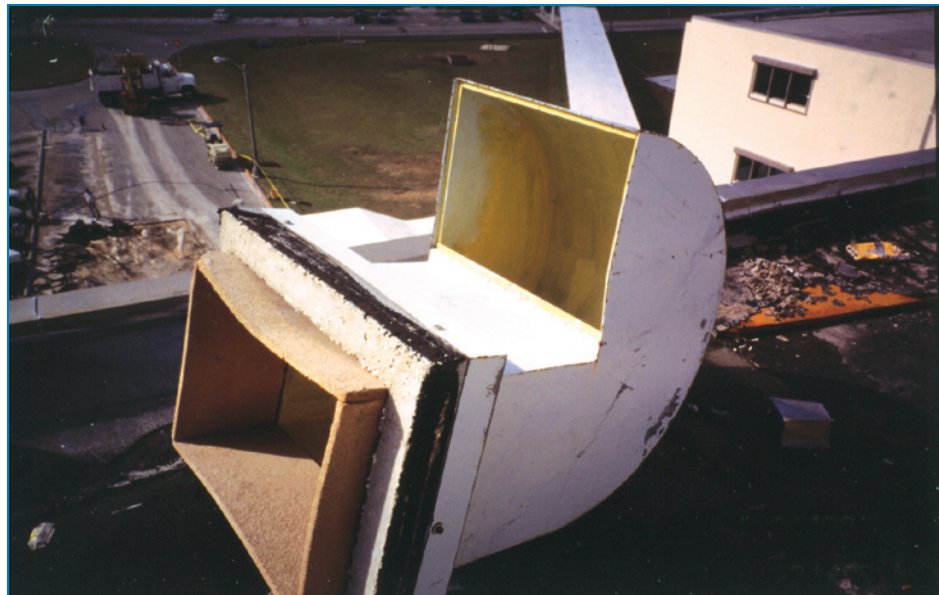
Although this 18,000-pound HVAC unit was attached to its curb with 16 straps, it blew off during Hurricane Ivan. (Florida, 2004)
